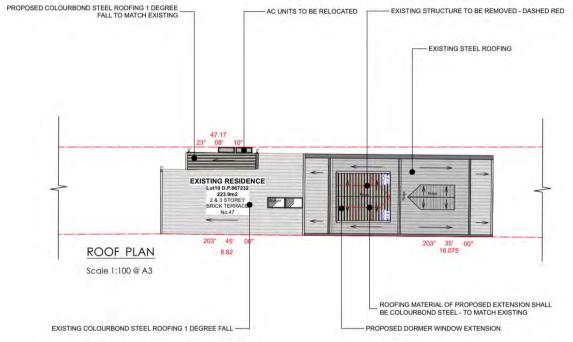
Roof Plan, Dwg No. C2 Rev G
